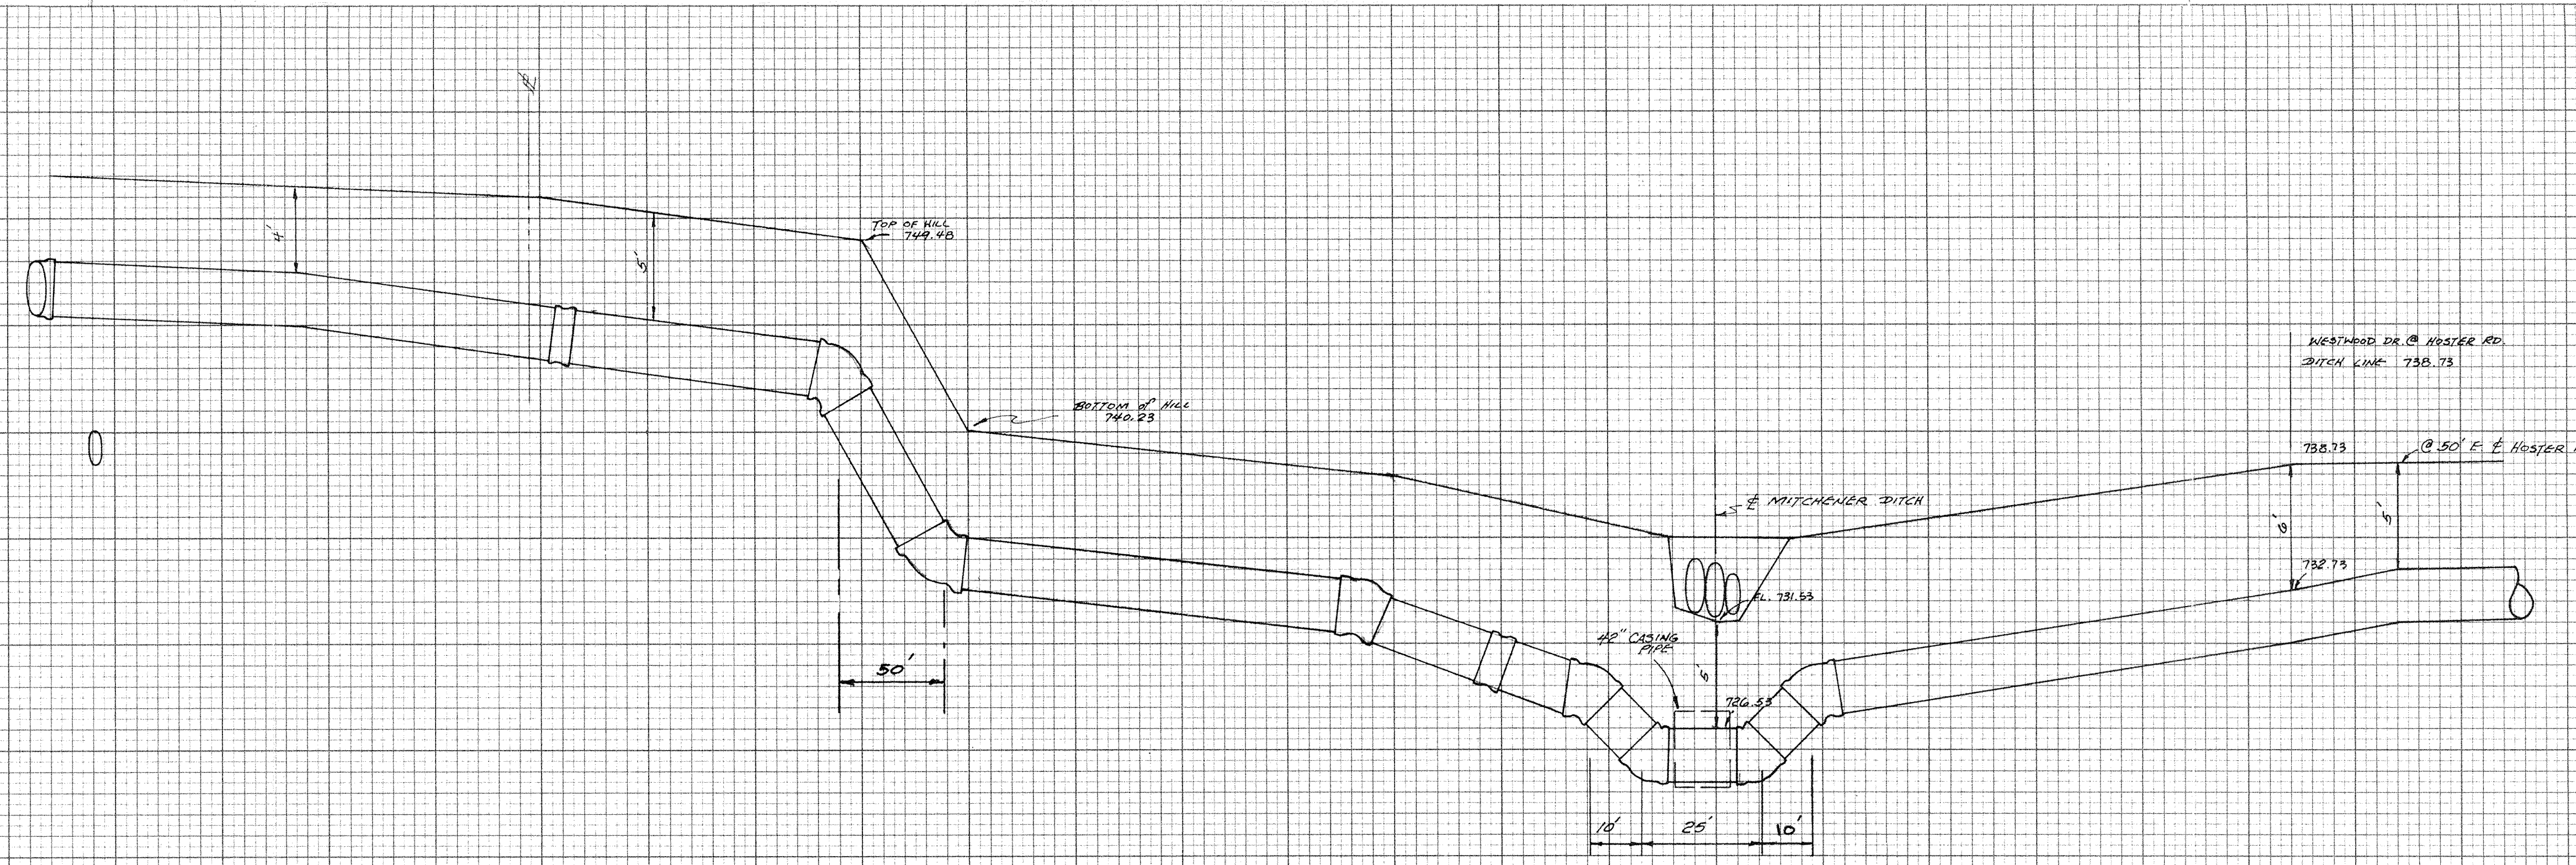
SINGLE PLAN AND CROSS SECTION-FULL LINE
